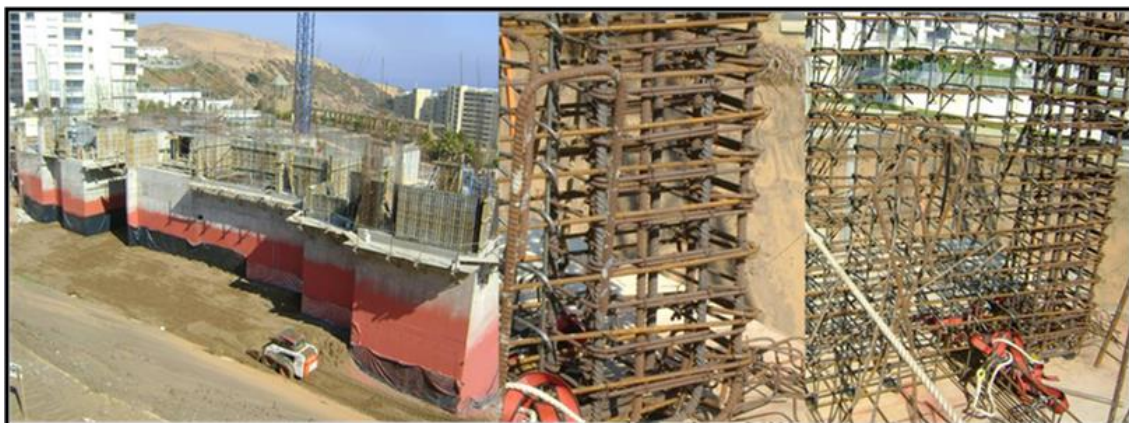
Heavy SBE and web transverse hooks in the web of structural walls in a building under construction in 2010 in Viña del Mar – Building 5.
